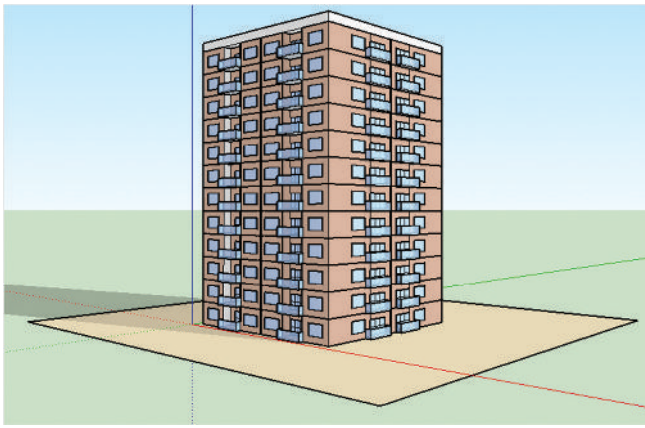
Case study building model constructed in SketchUp (Source: Author).
